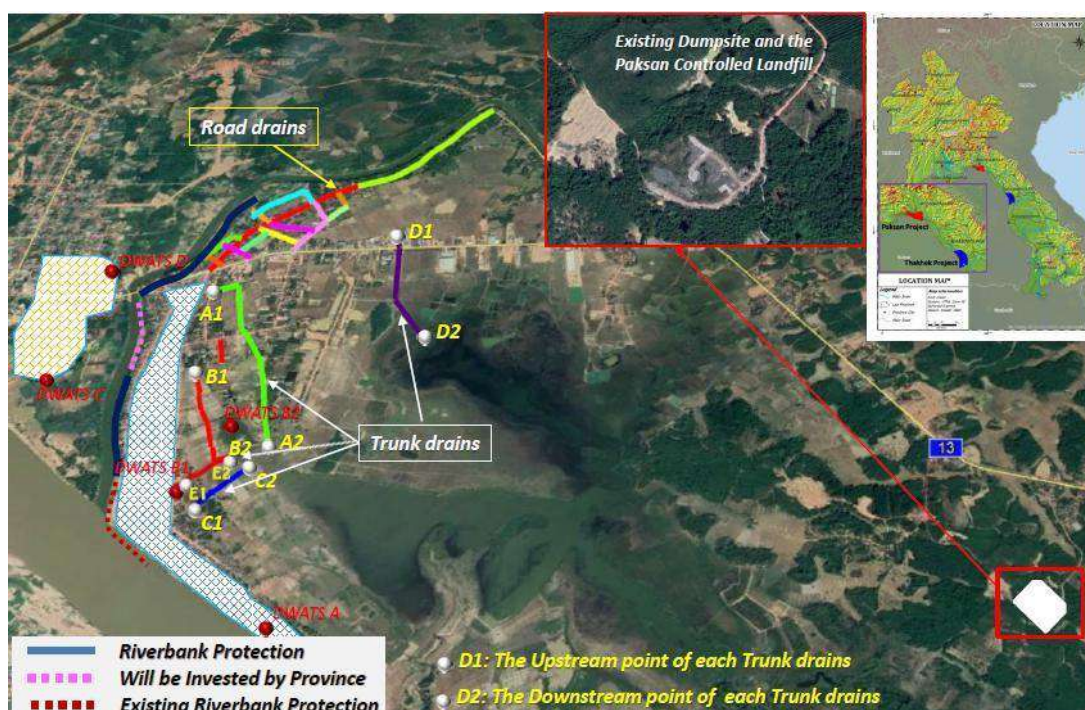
Location of drainage and bank protection works completed under the ADB Fourth Greater Mekong Subregion Corridor Towns Development Project (Source EMP RB-CW04 Lot 1)
